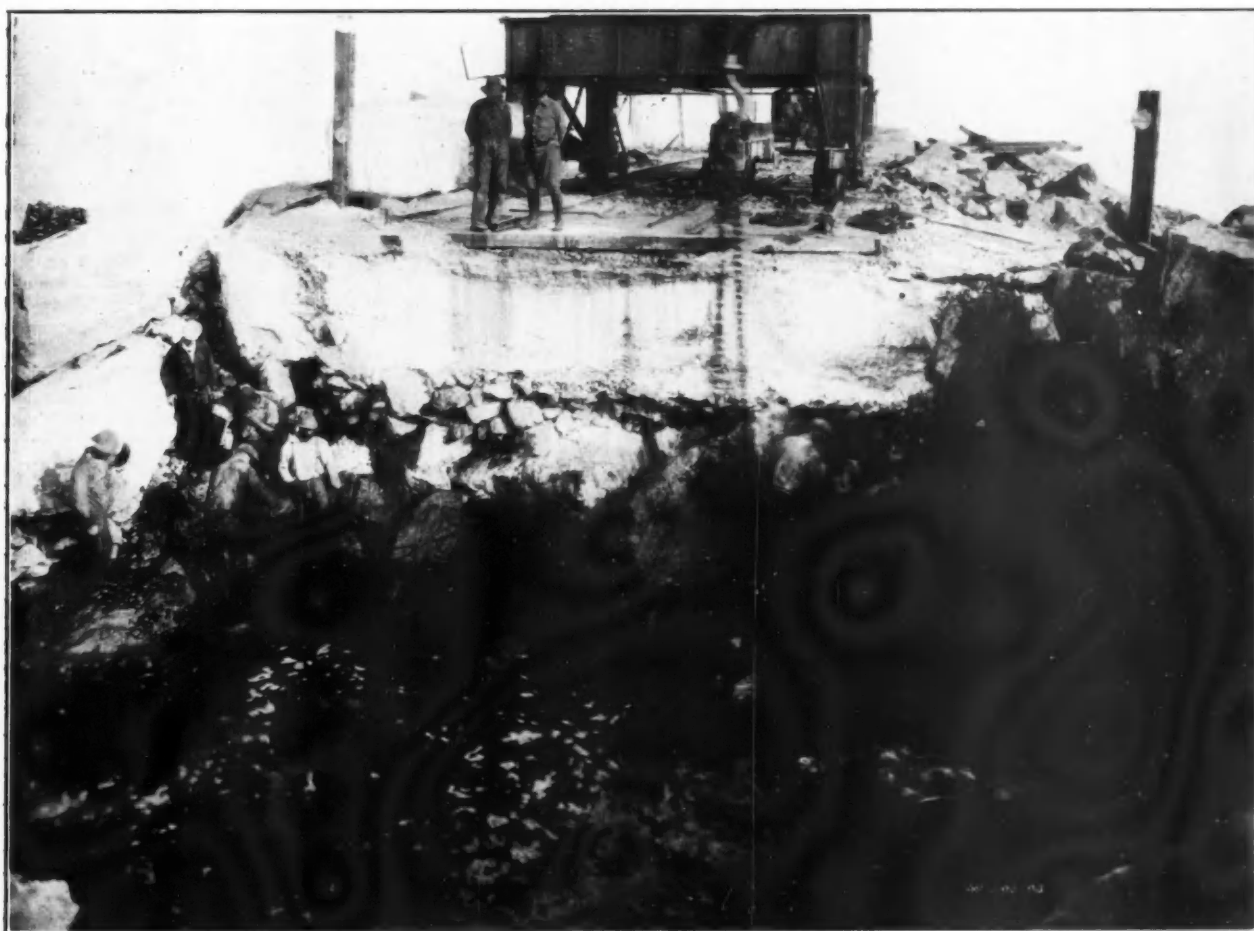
Excavating Pit for Monolith of Concrete at end of North Jetty. Concrete Cap at this point was 7-ft. thick. September 1925. Tide + 3-ft.
